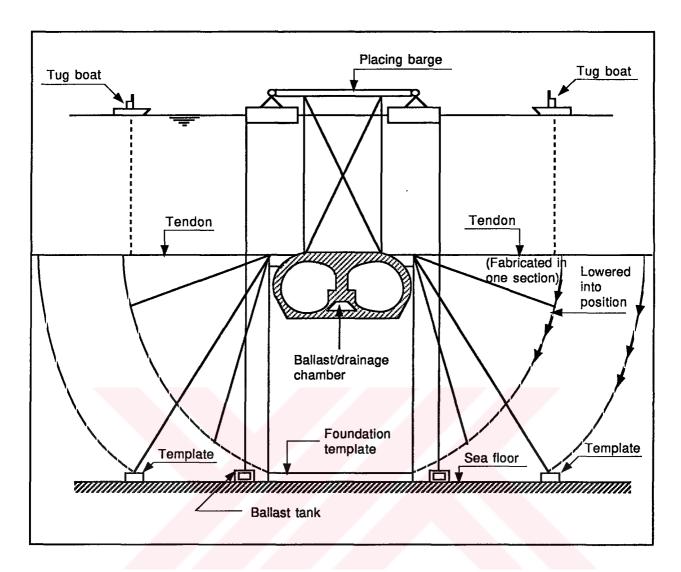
TENDONS INSTALLED FROM OUTSIDE
